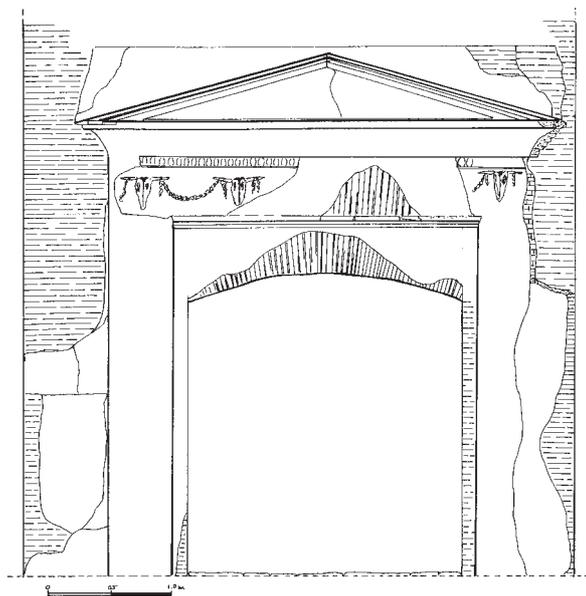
Caseggiato del Serapide, III x 3*, gateway placed at the point of intersection between two buildings (drawing author).
